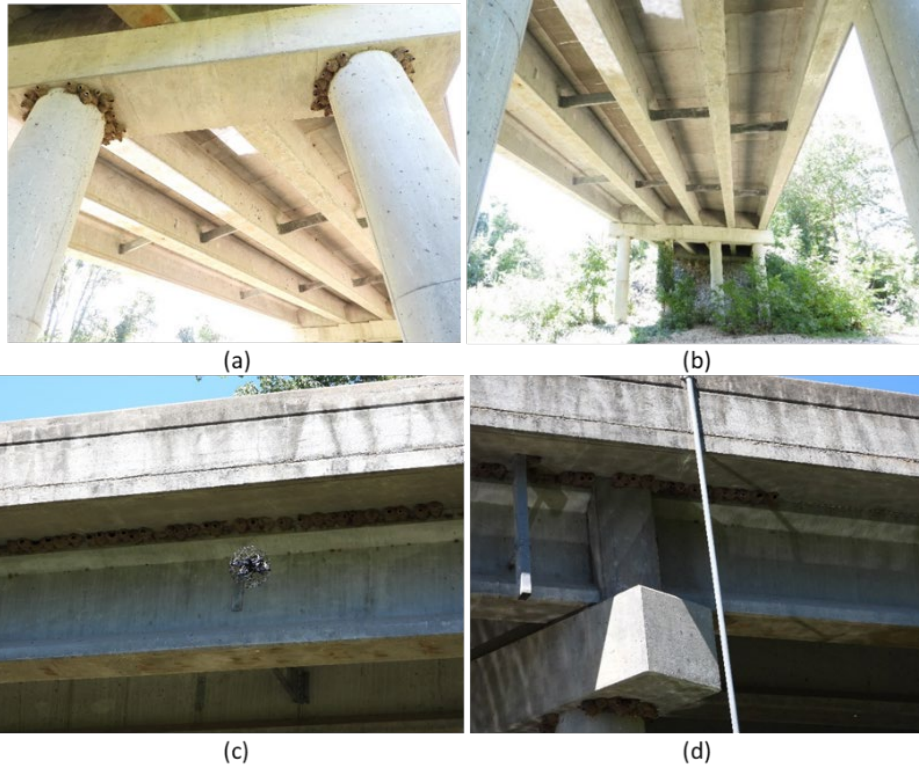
Missouri Prestressed Concrete Bridge A5805 (Nikon)
